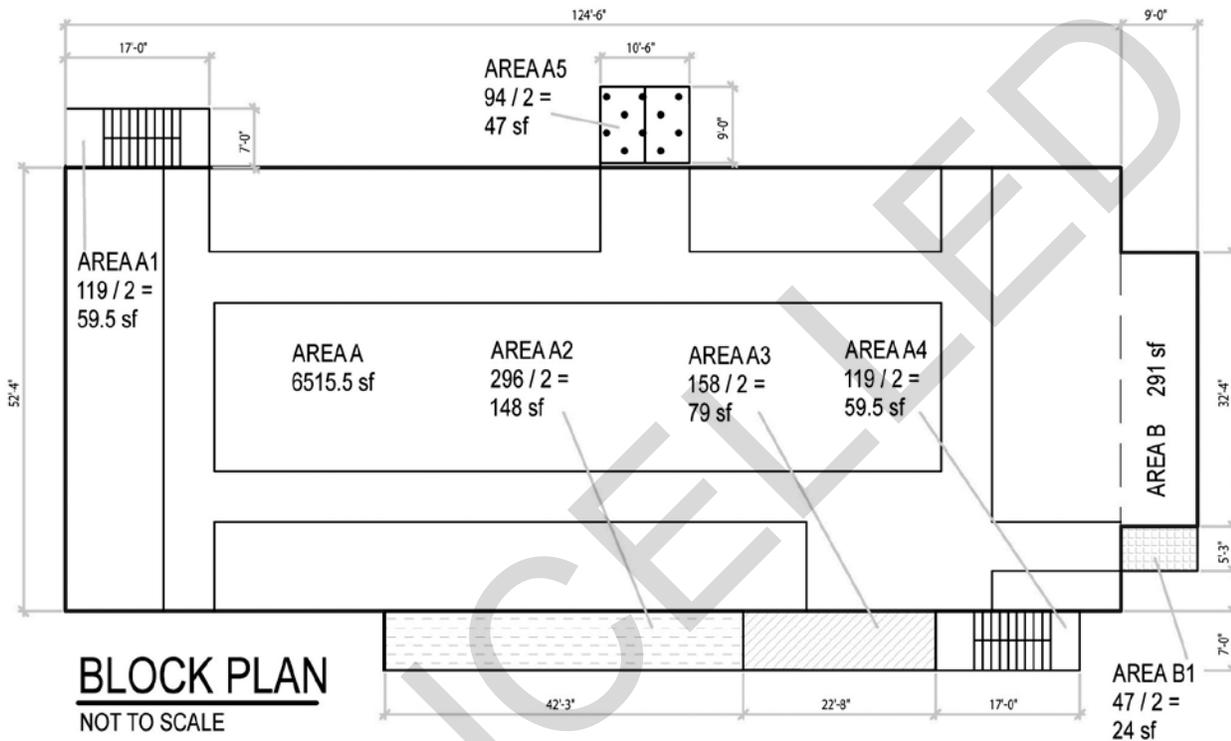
SAMPLE GROSS BUILDING AREA CALCULATION
